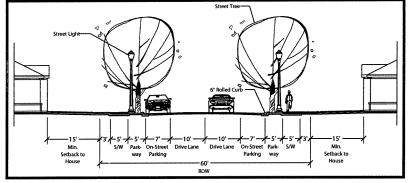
Residential Collector Street - Woodbridge by Del Webb, Section O
